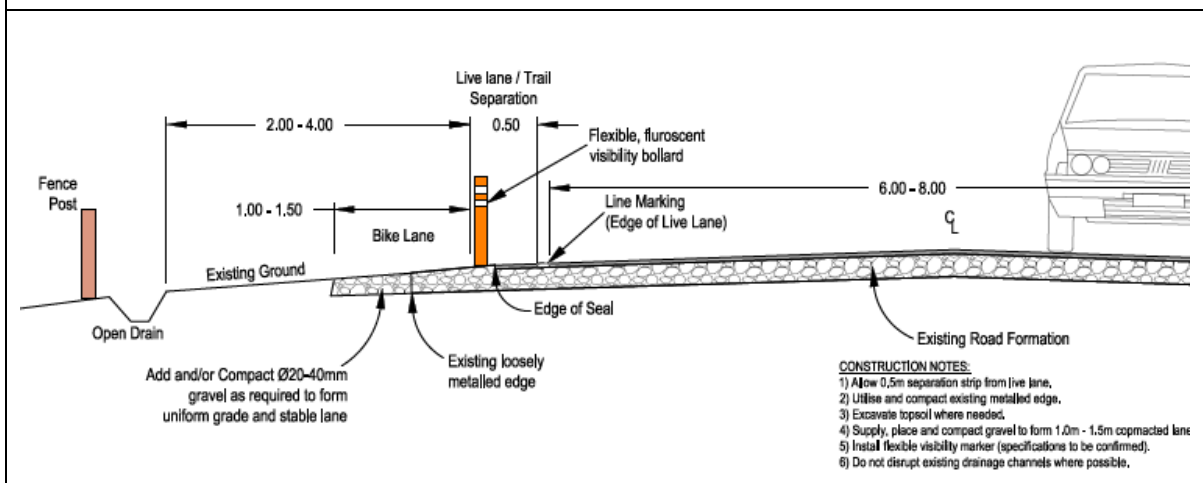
Typical Trail Cross-section: Multi-lane path adjacent to highway
